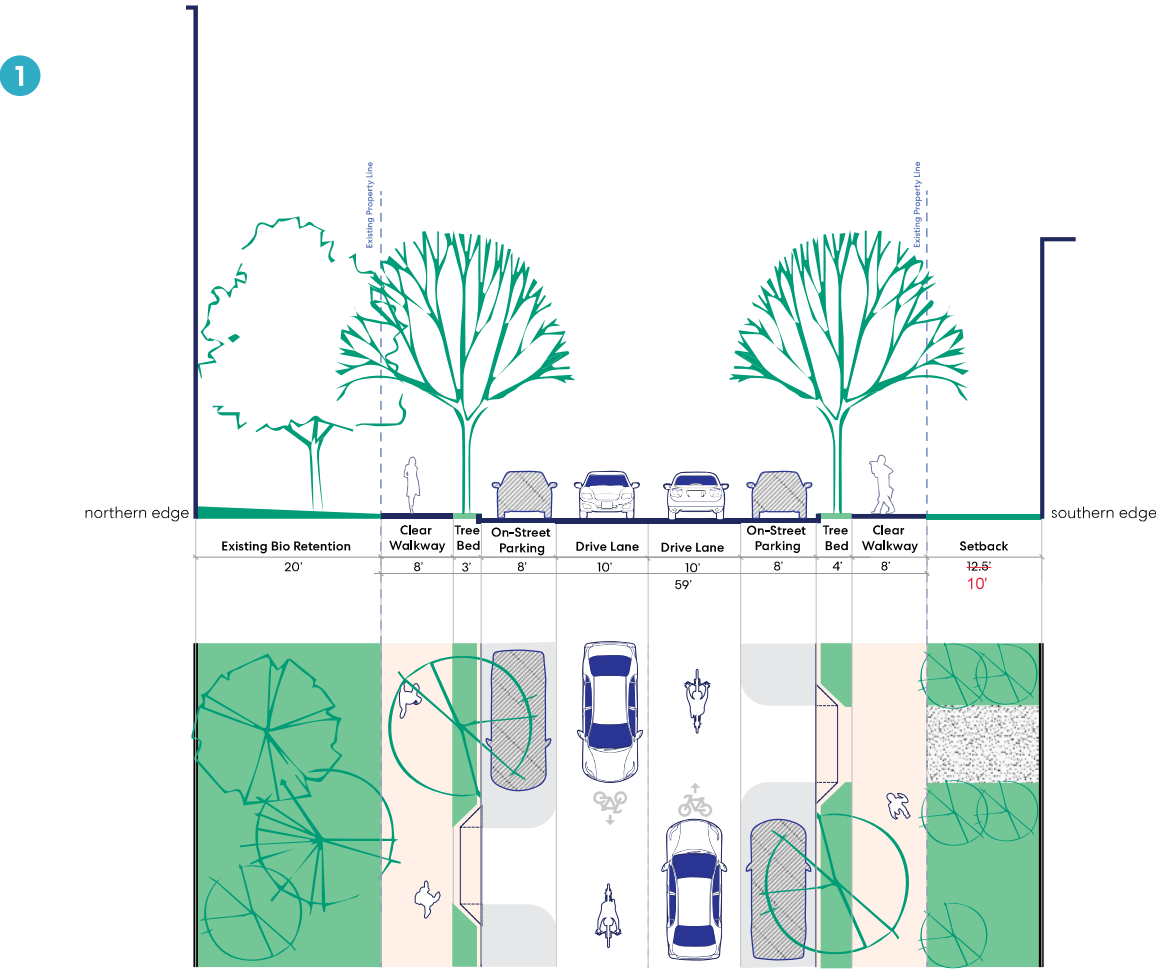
Typical Olive Avenue section between Park Boulevard and Ash Street
